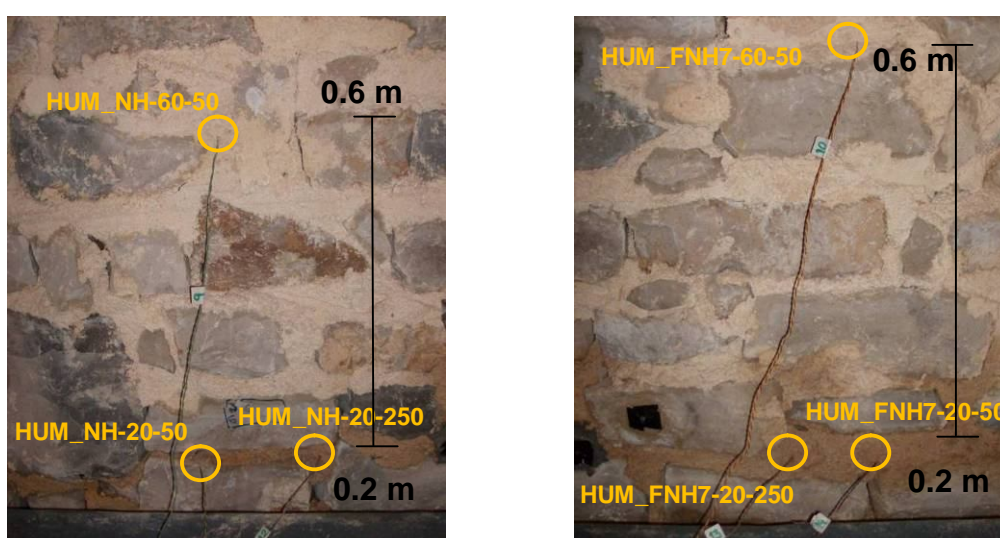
Location of humidimeter probes in the full-scale masonry wall: a) zone where NH was executed (left), b) zone where FNH7 was executed (right).
